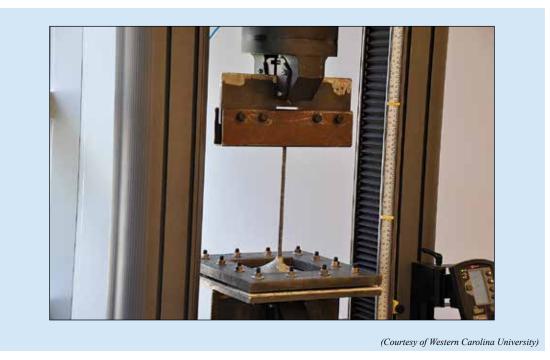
Connection capacity testing – threaded steel rod to FRP laminate
